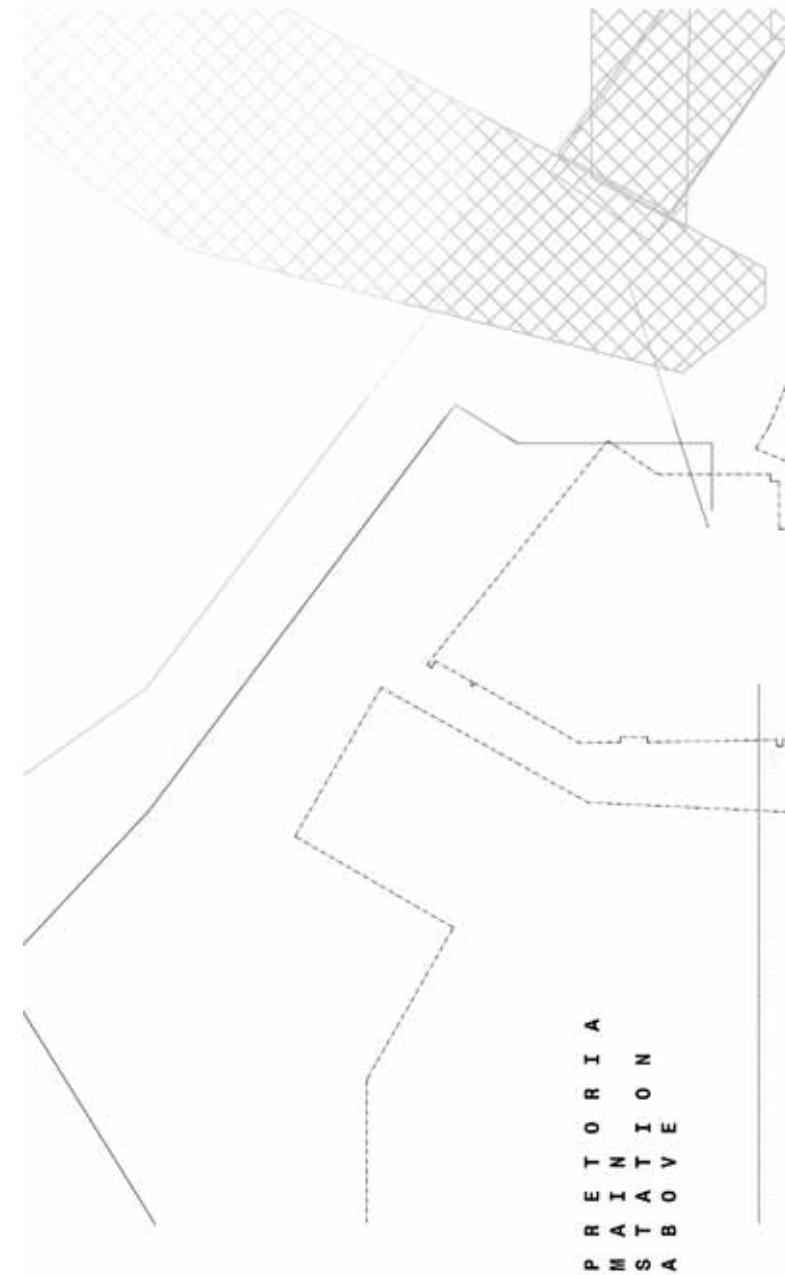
Ground floor plan, not to scale [Source: Author]
